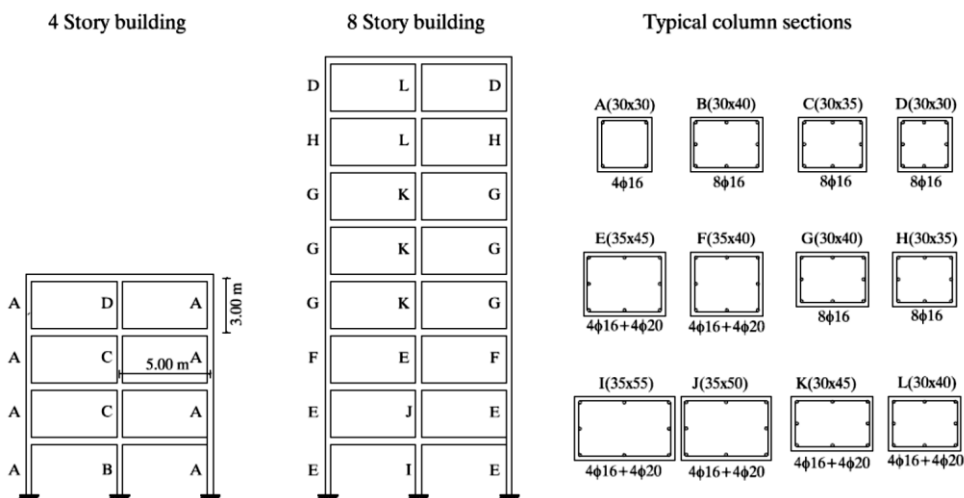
Model geometry and typical columns section and reinforcement.
